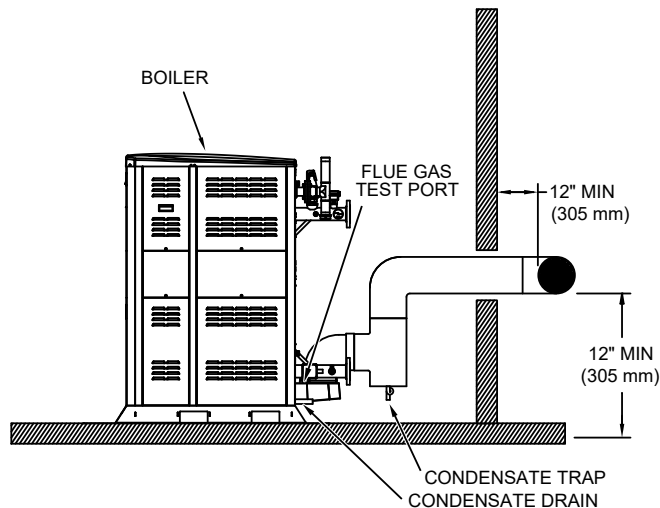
Horizontal Through-the-Wall Venting for PVC/CPVC
